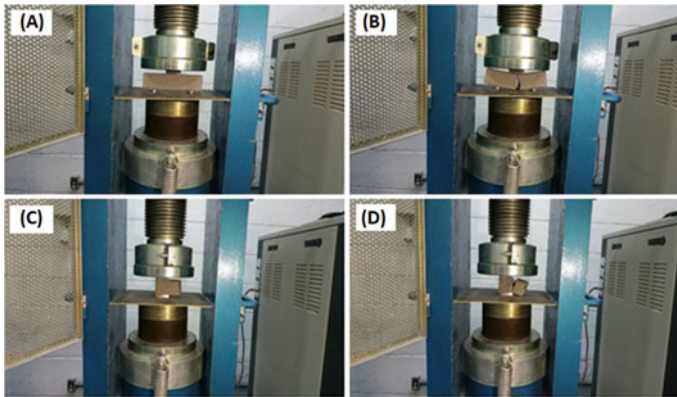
Carrying out the flexion (a, b) and compressive (c, d) tests: a positioning of the specimen the support devices of the test equipment; b specimen after rupture; c positioning of the specimen in the support devices of the test equipment; d specimen after rupture
